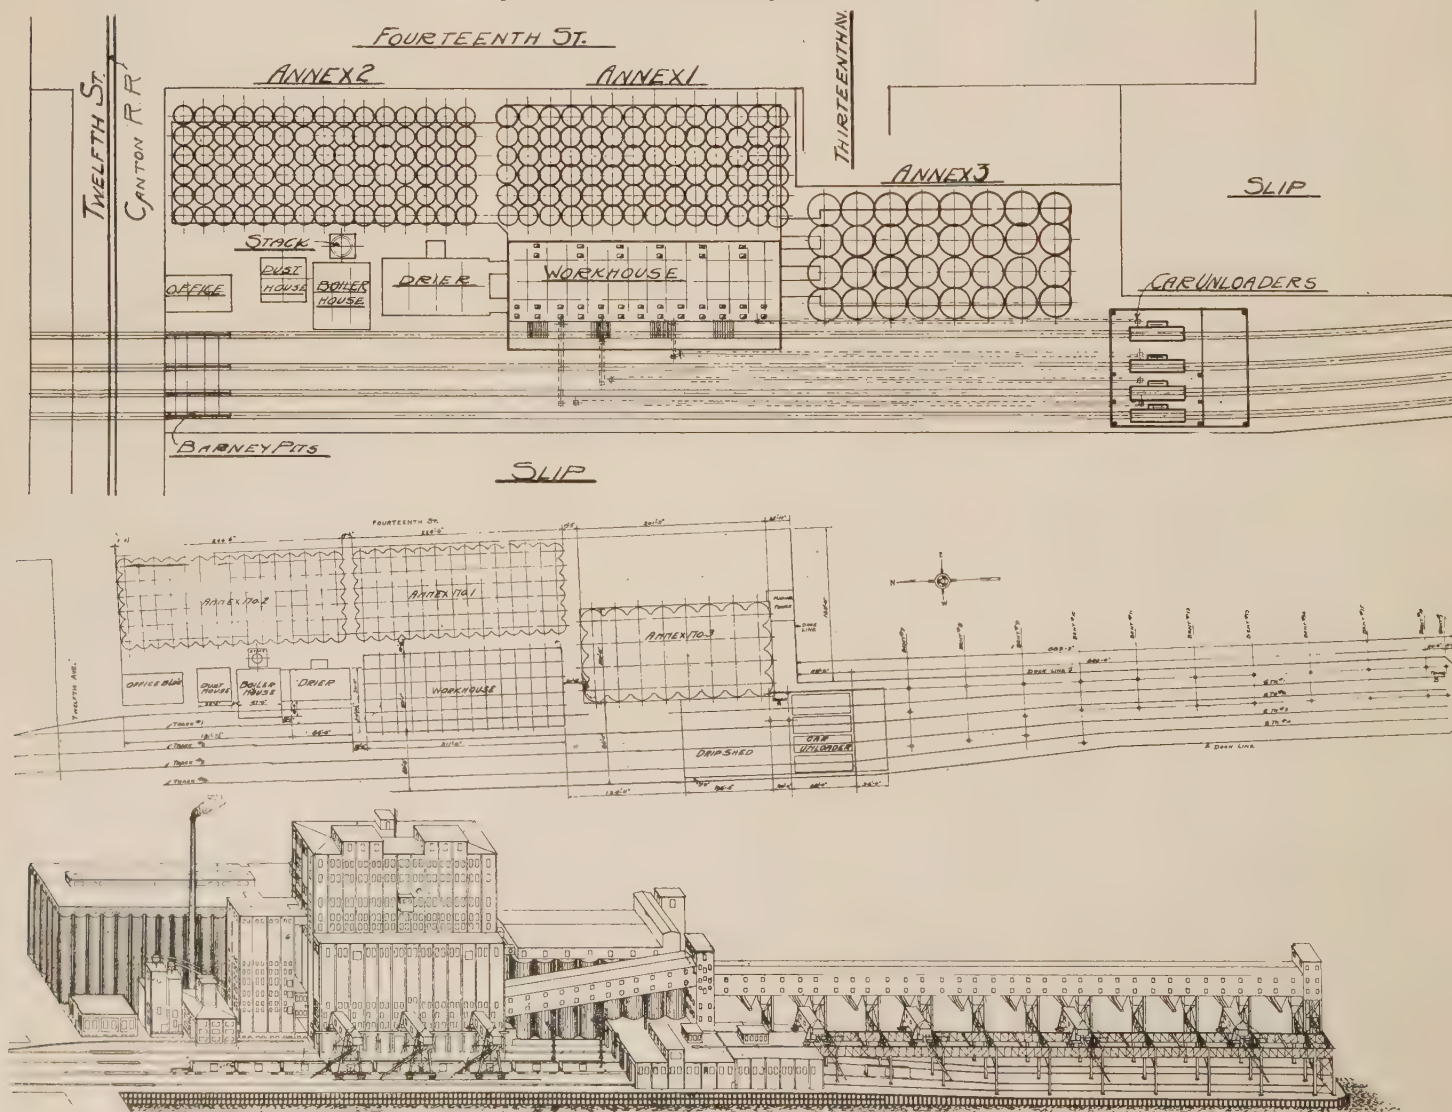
Ground Plan and Perspective Elevations of Northern Central's 4,200,000 bu. Concrete Elevator and Annex at Baltimore, Md.
